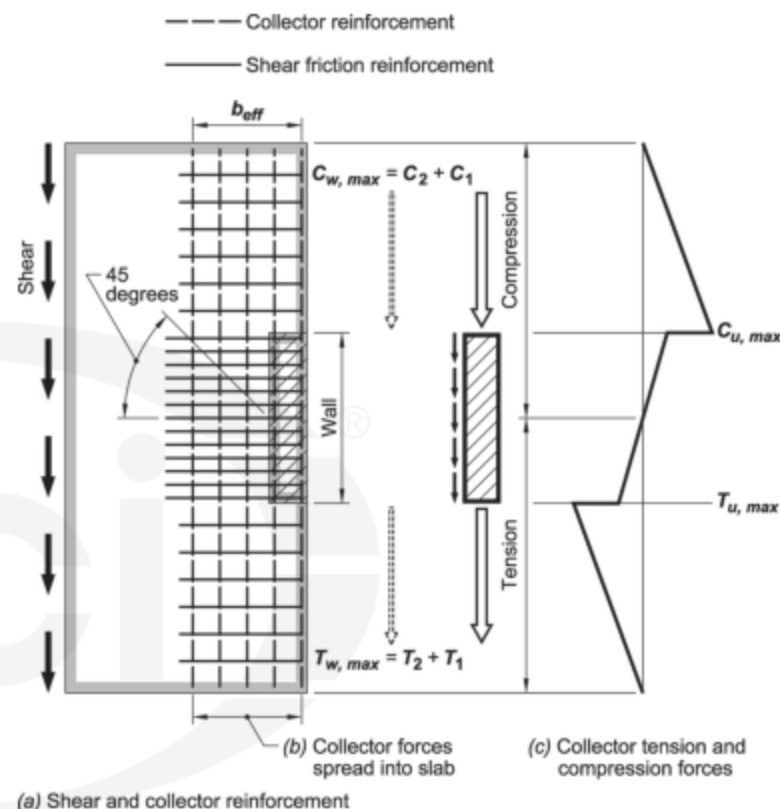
Collector wider than the shear wall; forces are reversible.
